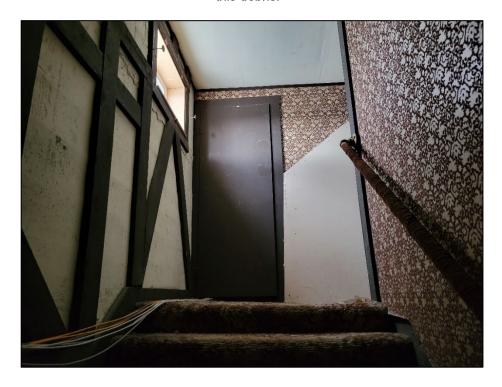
RF01: Asphalt roofing debris containing 7% chrysotile ACM on the first-floor storage room (door at top of stairs).
